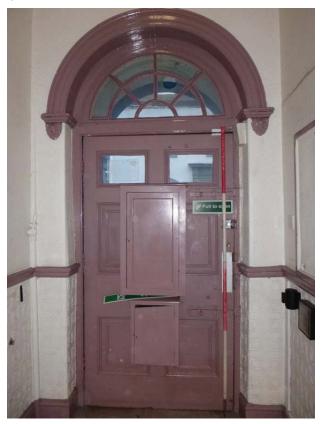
Doorway in the west elevation of Room G2, viewed from the east
